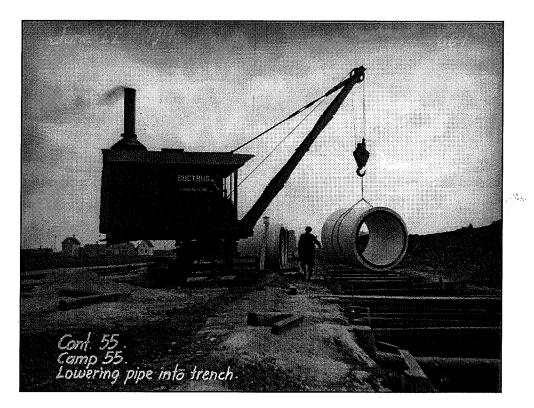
Pre-cast pipe segment used to construct the Branch 1 Aqueduct. (Construction Photograph No. 667)
